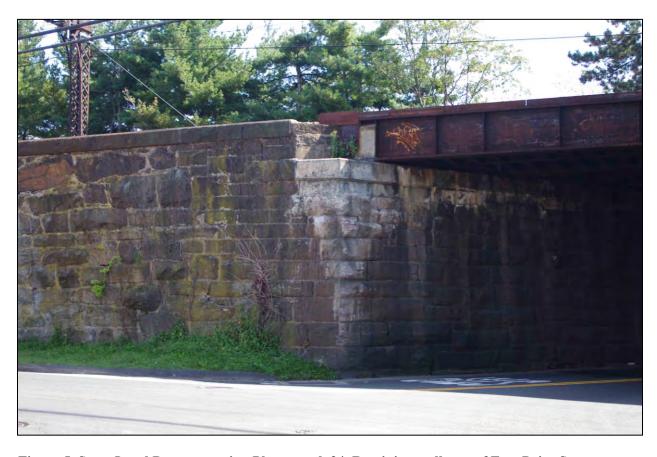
State-Level Documentation Photograph 24. Retaining wall east of Fort Point Street Railroad Bridge, detail of junction between the wall's rubble masonry and the bridge abutment's ashlar masonry, camera facing southeast (AHS photograph, 9/2017).
